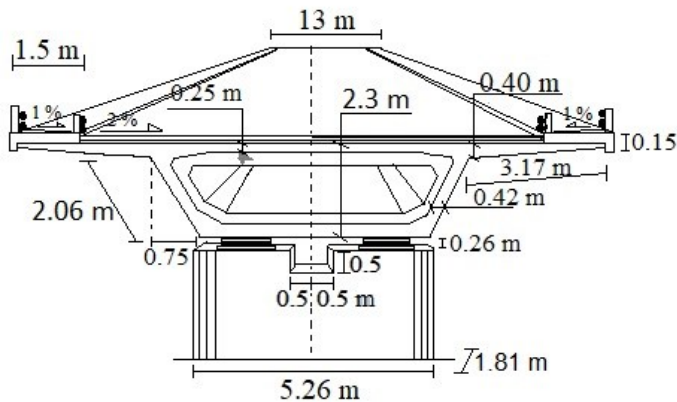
Cross-section and dimensions of the Arosa coastal and concrete bridge.
